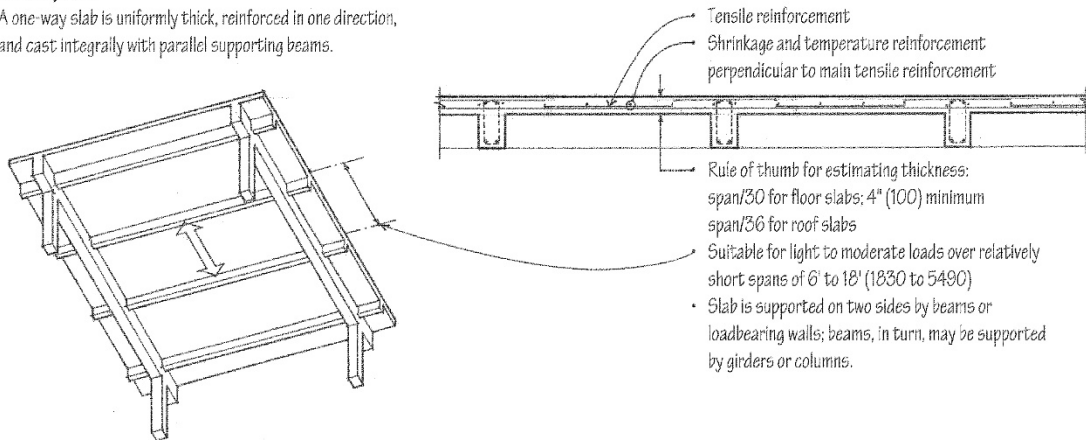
Typical one-way reinforced concrete slab system, courtesy of [7]
